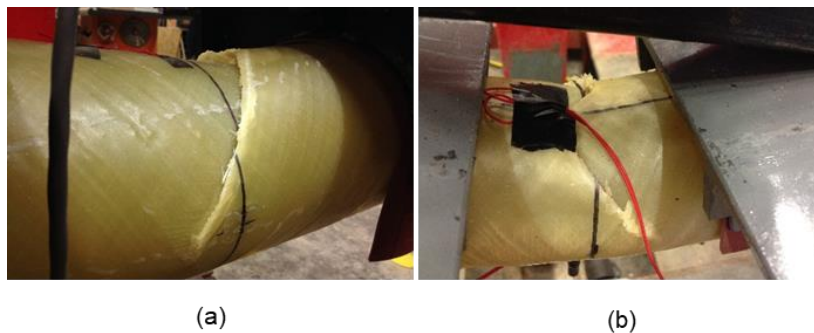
Failure Modes: (a) Top of Failed D203 Specimen (b) Top of Failed D76 Specimen
